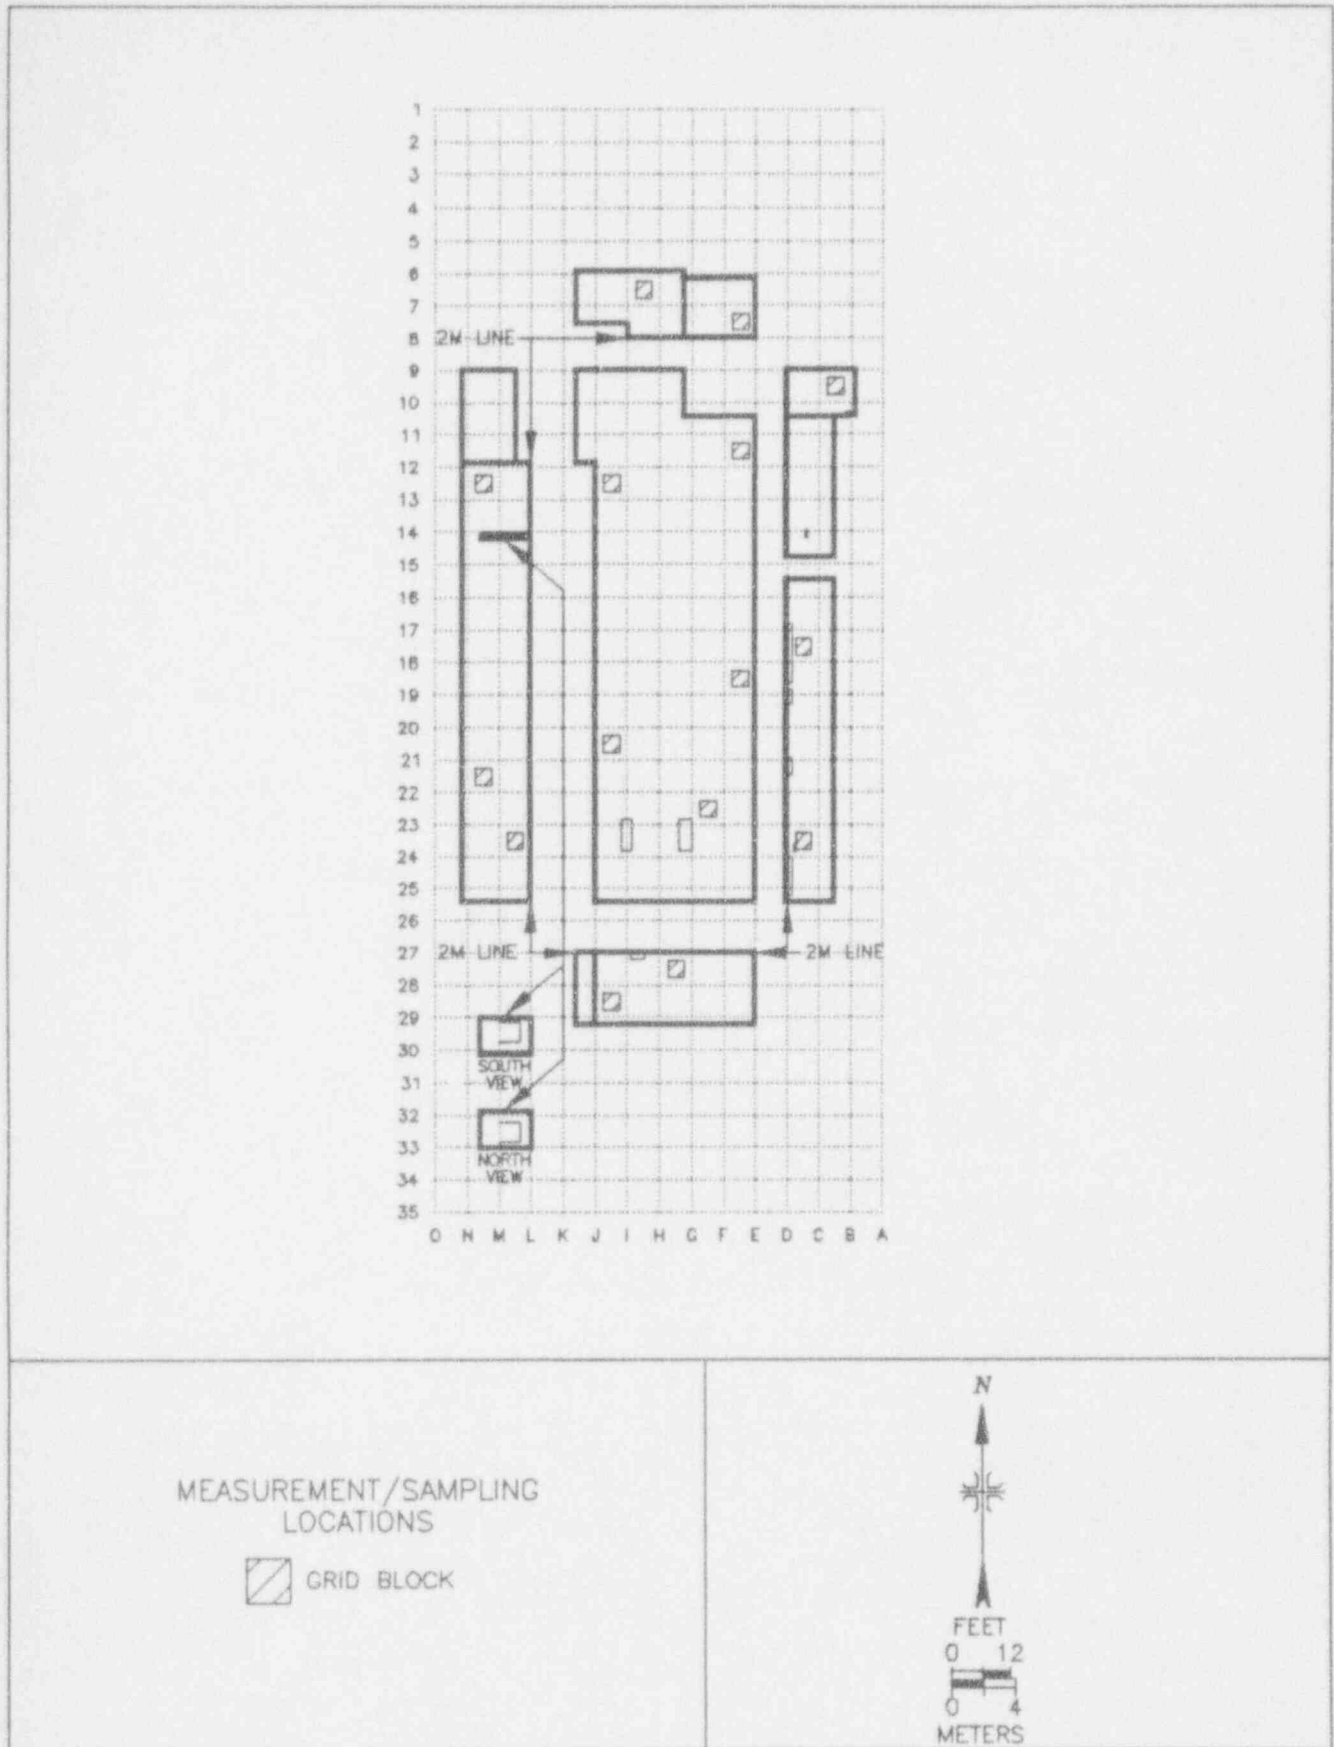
Unit 2 Main Room, Upper Walls and Ceiling - Measurement and Sampling Locations
